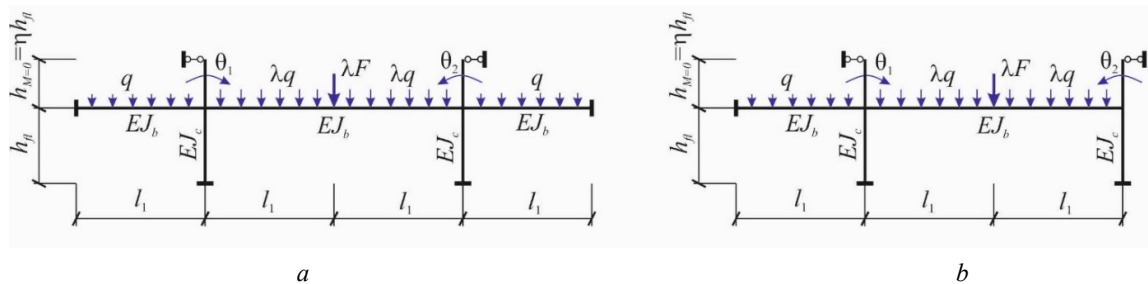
Reinforced concrete frame structure in the zone of potential local collapse:
